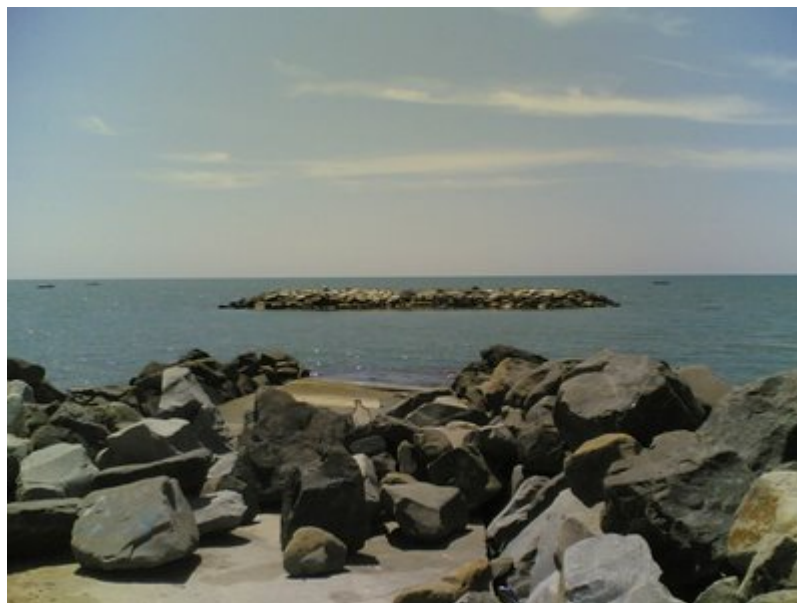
Typical Arrangement of an Offshore Breakwater
